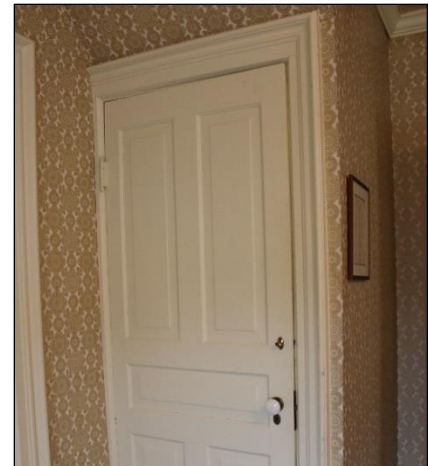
(right). Door trim, Upright (basement door in Dining Room, looking NE; Inset: kitchen doorway detail in Dining Room, looking NE).
